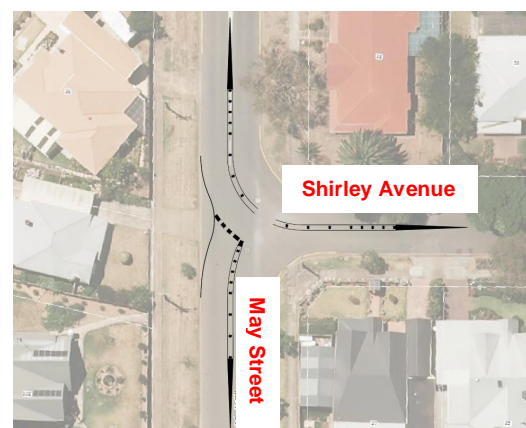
Proposed modified T-intersection at May Street / Shirley Avenue
